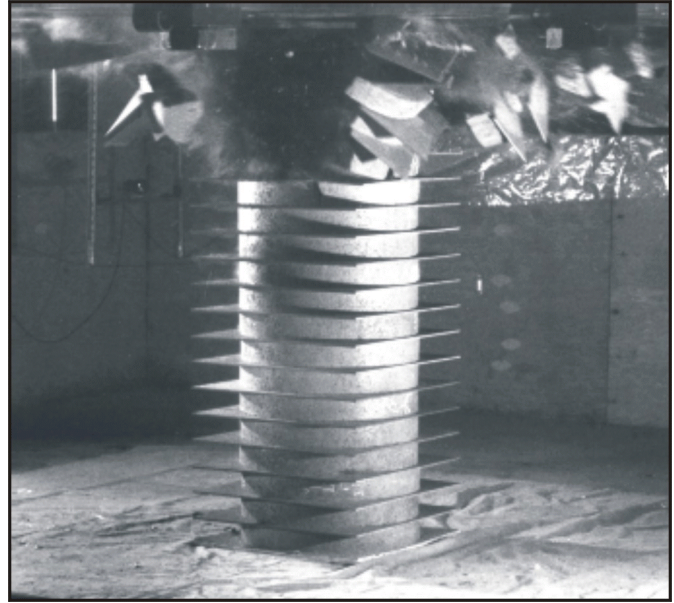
Violent failure of concrete crib at 5 in/min applied convergence.
